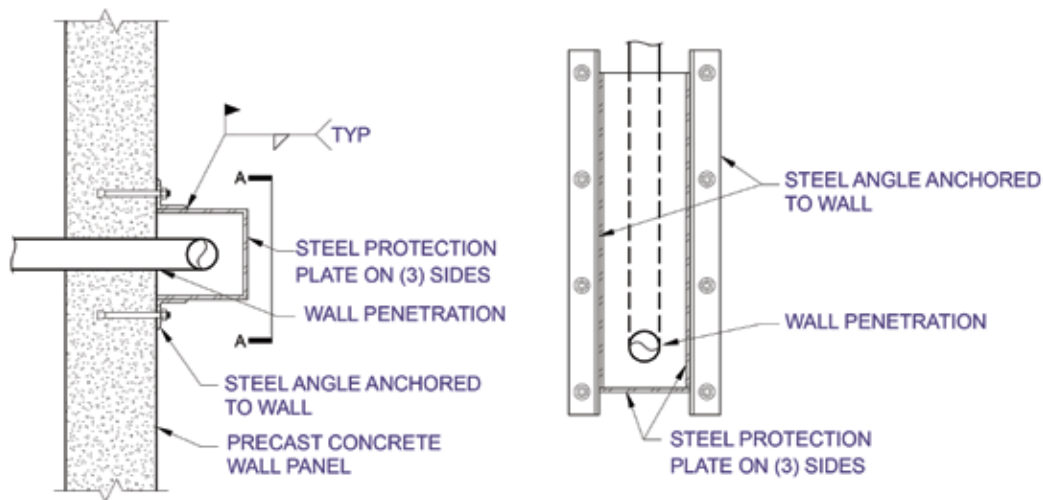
Plan view – pipe penetration in exterior wall (left); Elevation view A-A (right).
